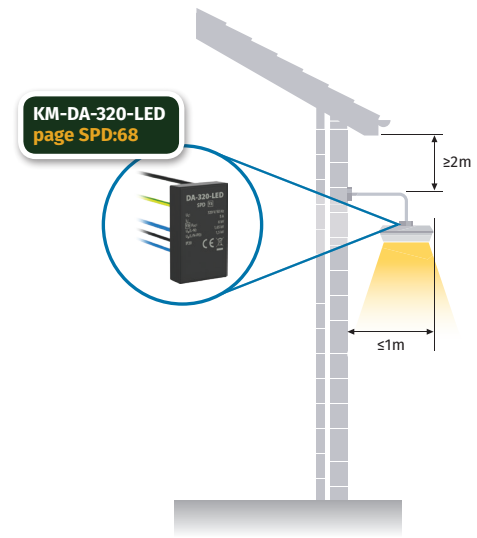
Light fitting mounted on the external wall of a building (of up to maximum 45m), conforming to EN 60728-11 ed.2.
